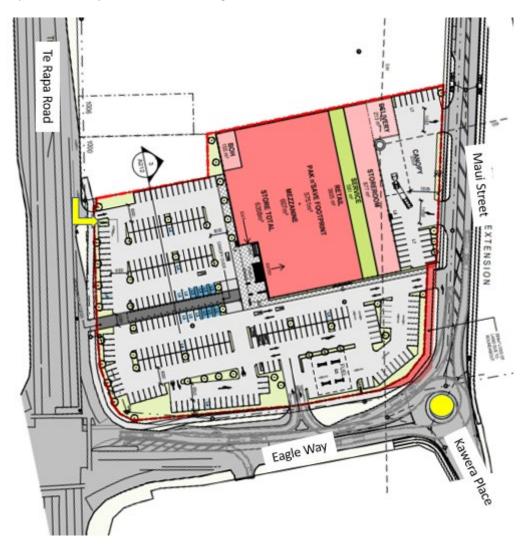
Proposed Pak n Save, Te Rapa site layout.
